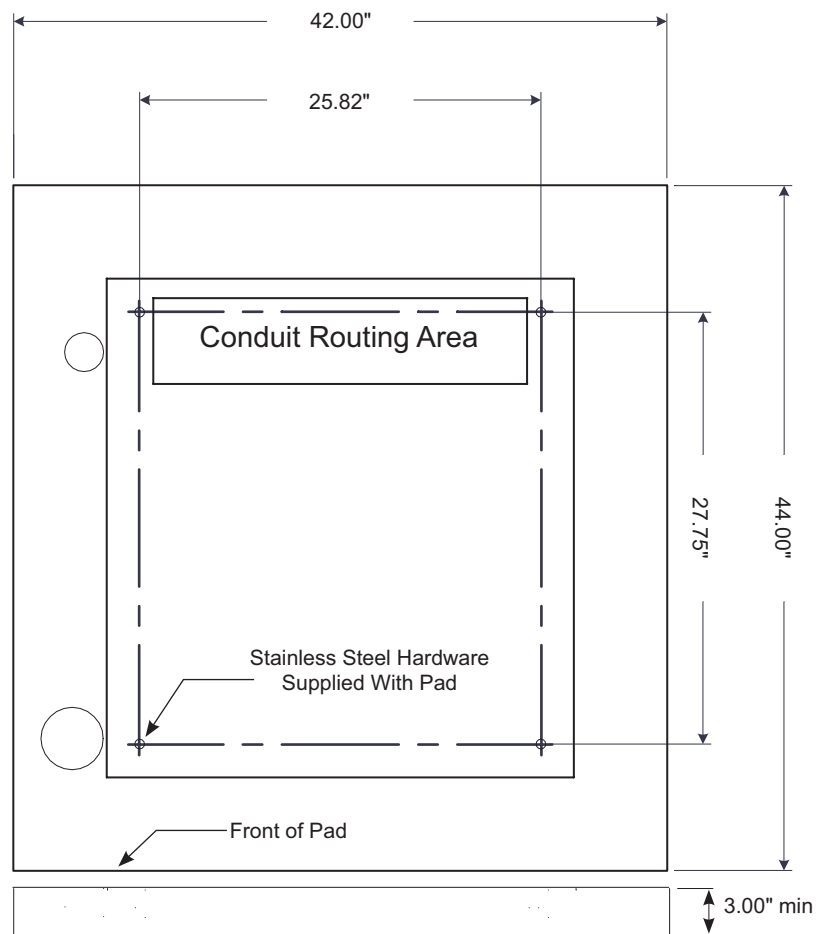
, Pad Dimensions for Single-wide Enclosure
